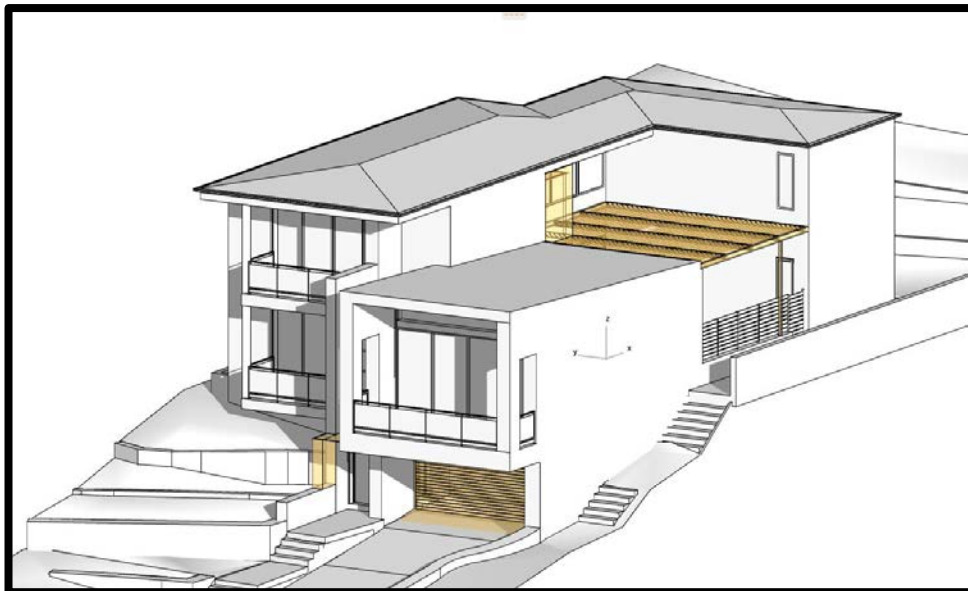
Proposed works in orange. (*Action Plans 2020.*)
